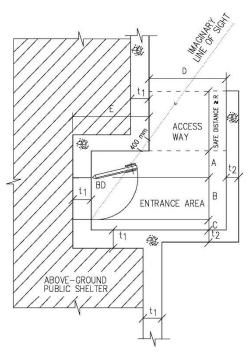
Plan - Typical Layout Of An Entrance Area To An Above-Ground Public Shelter (Possibility B)
